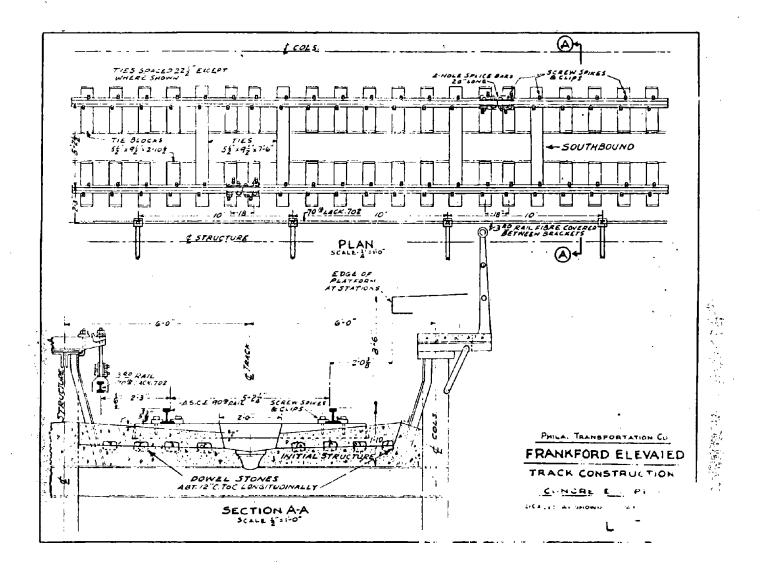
SEPTA FRANKFORD LINE CONCRETE VIADUCT TRACK CONSTRUCTION
